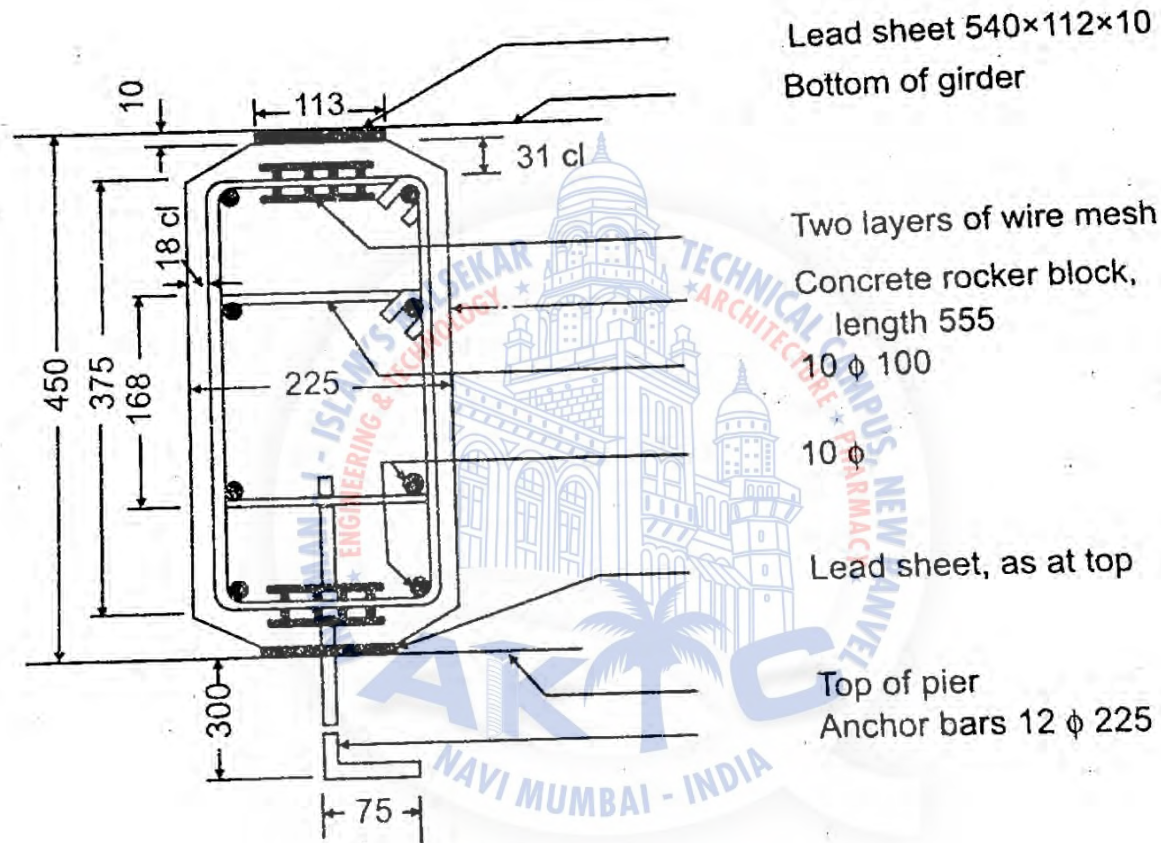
R.C. Rocker Bearing of Dimni Bridge.
